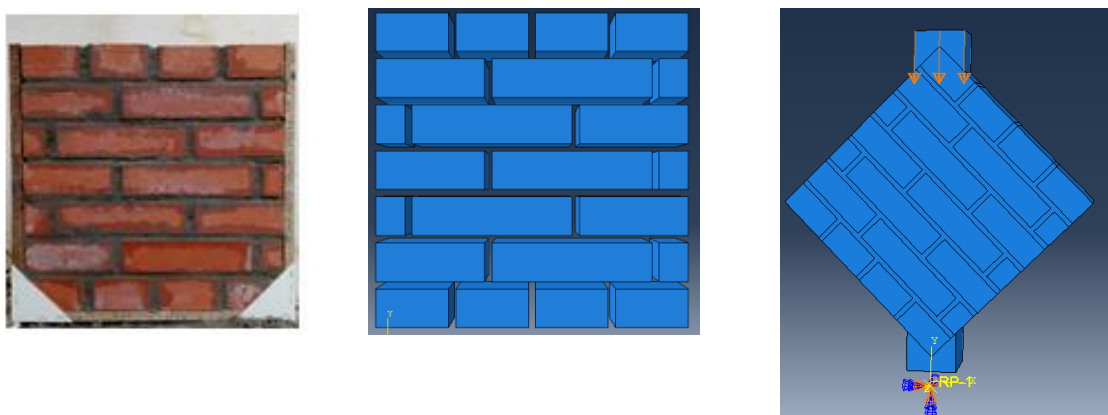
numerical Model (DMM) and boundary conditions of unreinforced brick masonry wall
